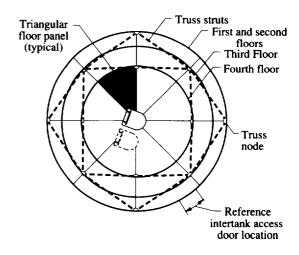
Alignment of floors and truss struts inside lunar habitat.
